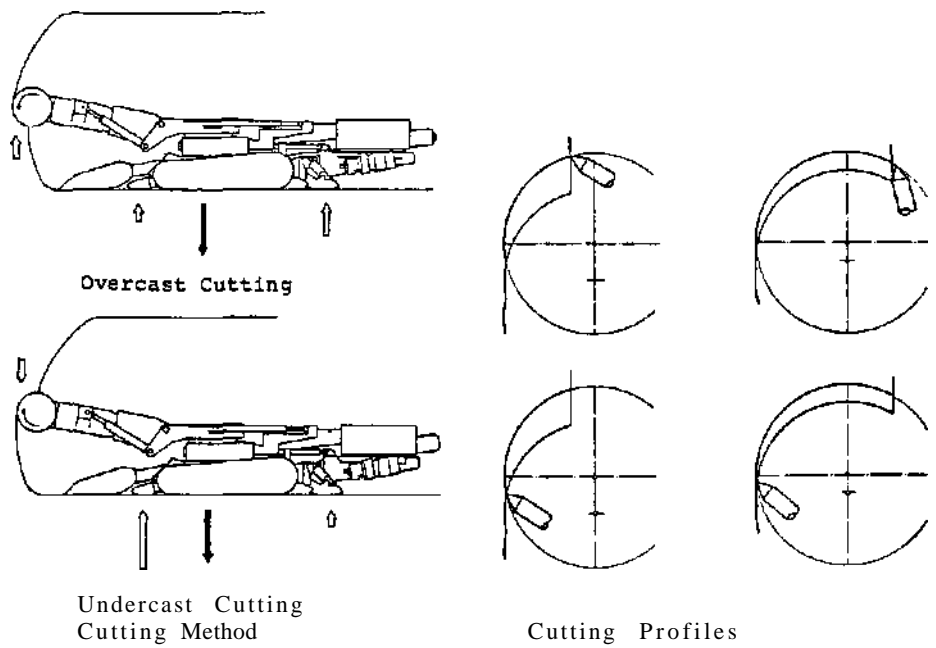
Cutting principle, cutting method and cutting profiles of sectional cutting machines.
